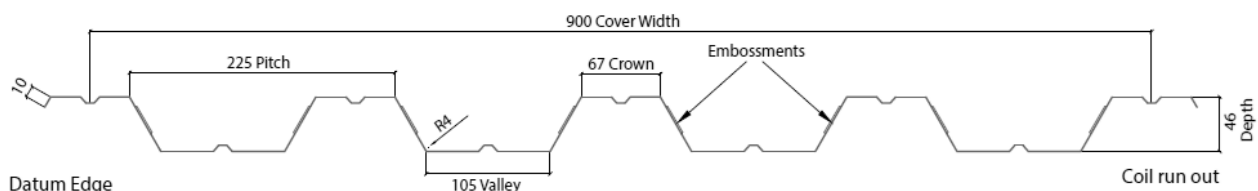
ComFlor steel sheet section (source: tatasteelconstruction.com)
